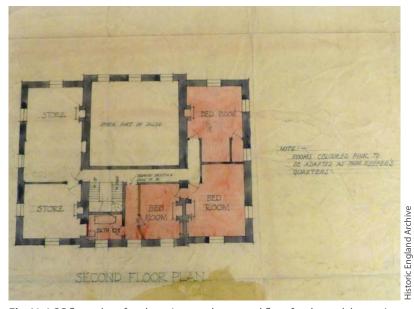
LCC floor plans for alterations to the second floor for the park keeper's accommodation, 1950s
